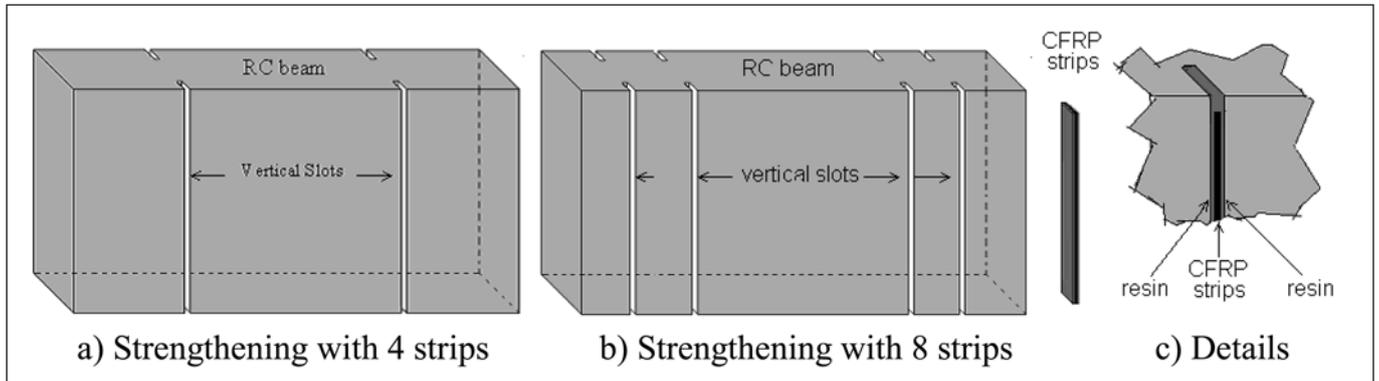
Typical view of the specimens using near surface mounted strengthening technique
